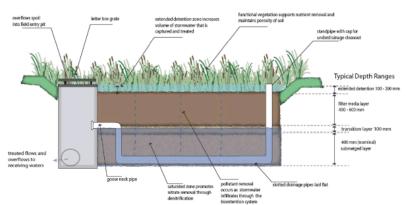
Typical Bio retention Basin Minor Storm Outlet Configuration SOURCE: Townsville City Council WSUD Guidelines - Chapter 5.
